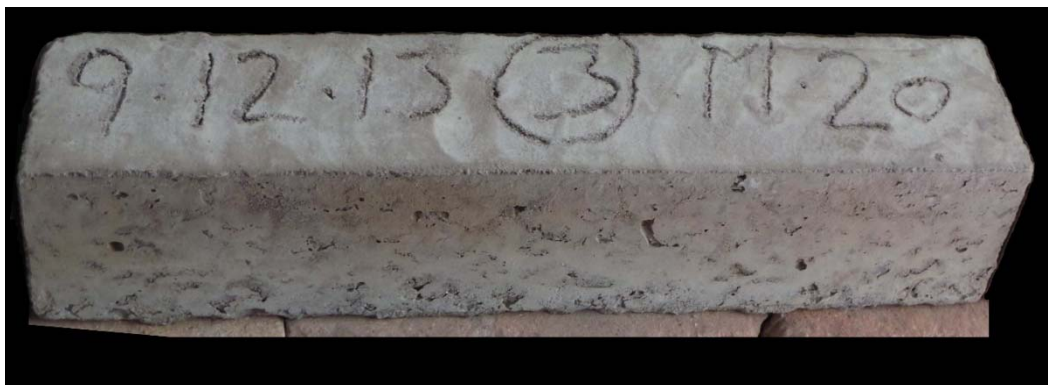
(a). Crack pattern of GA concrete upto 500 °C
